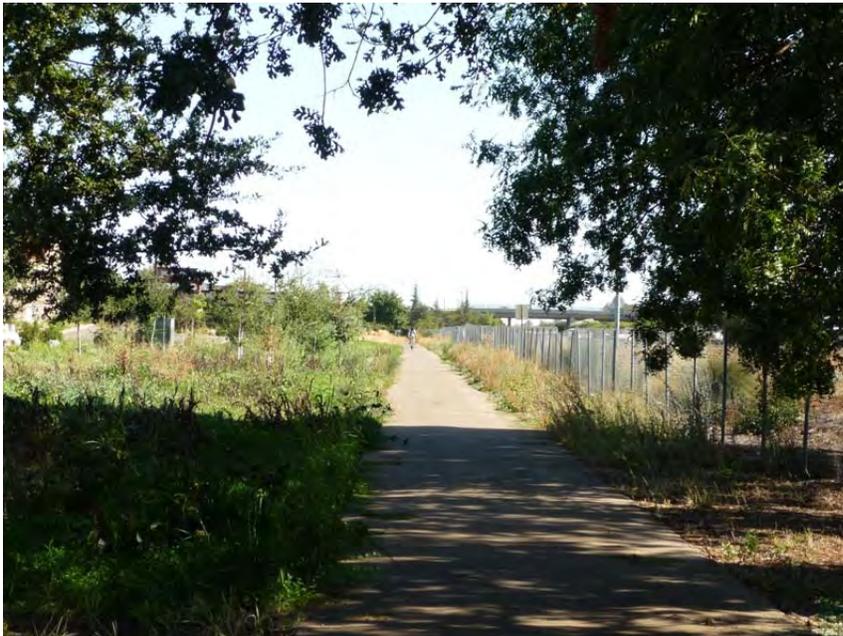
Existing facilities extending south from Teichert Ponds, behind Kohls.
